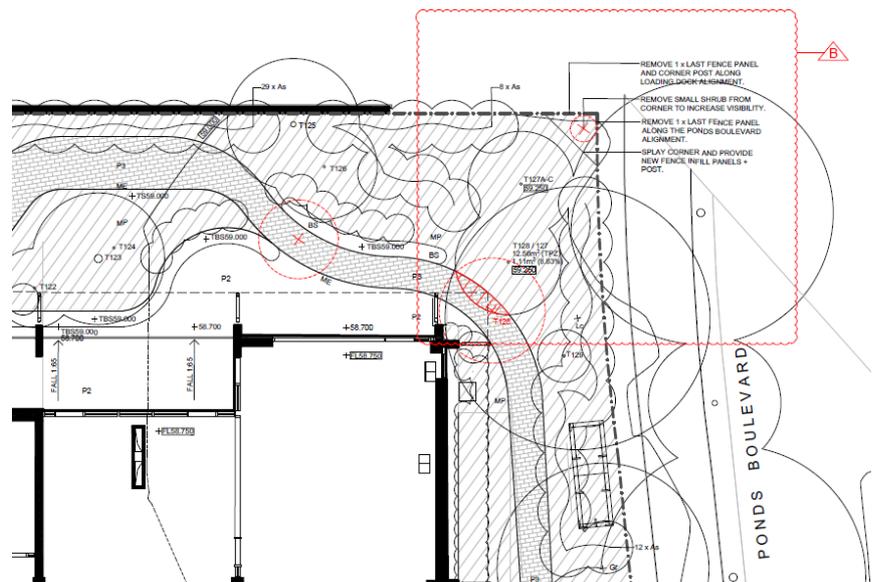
Detailed landscape plan showing changes to fencing at the north-east boundary of the site
